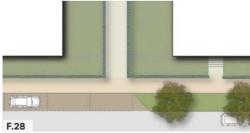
Illustrative diagram showing an indicative layout of on-street inset parking.
